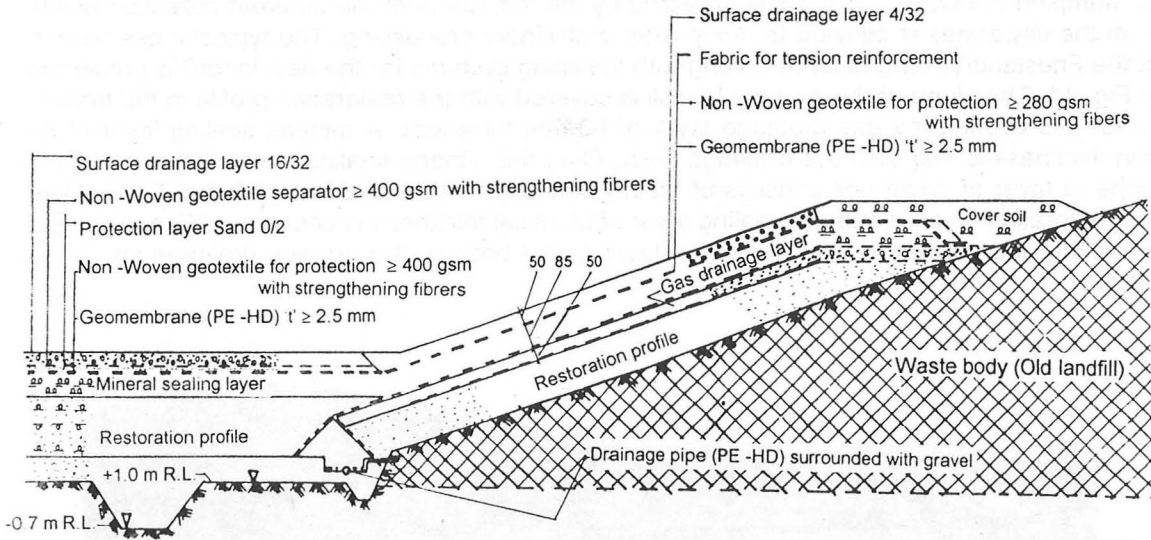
Typical cross - section of Friesland/Wittmund landfill
